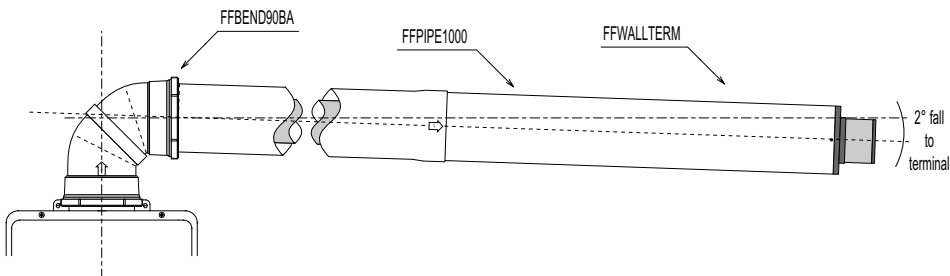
Horizontal Extension Flueing with Wall Terminal (FFU models)
